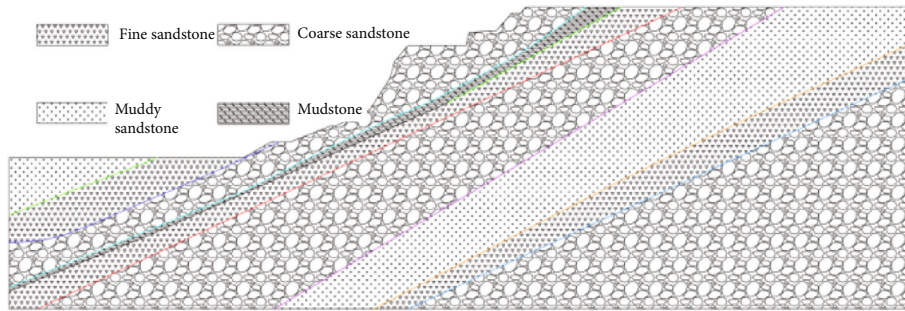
Profile of nonworking slope under the present open pit mining situation.
